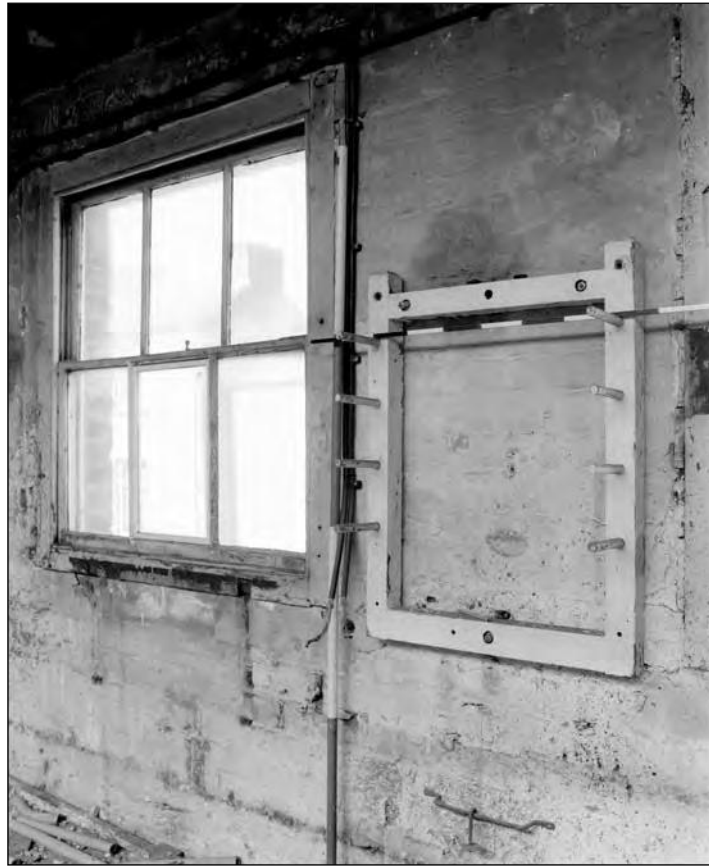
Building 2; second floor, detail of window & wall rack in A32a (Film 1.9)
